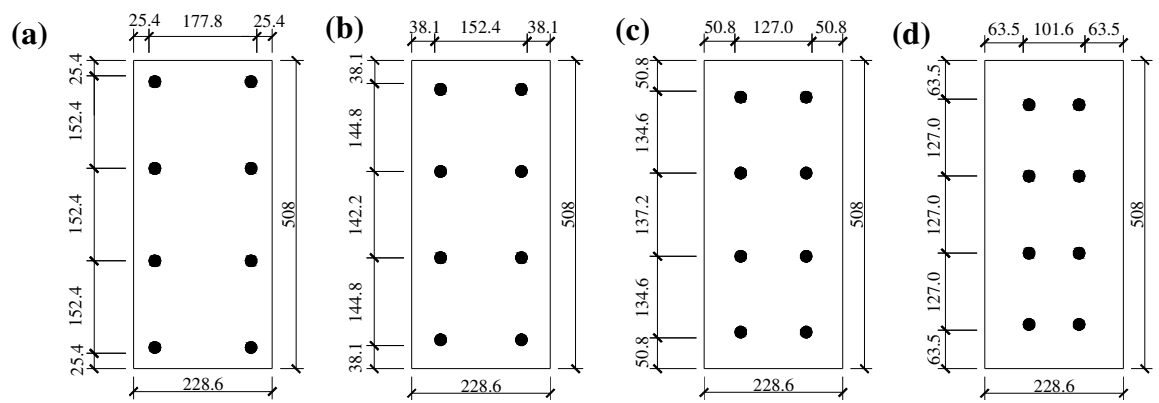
Cross section views of concrete blocks with four concrete cover thicknesses: (a) 25.4 mm, (b) 38.1 mm, (c) 50.8 mm, and (d) 63.5mm (unit: mm).
